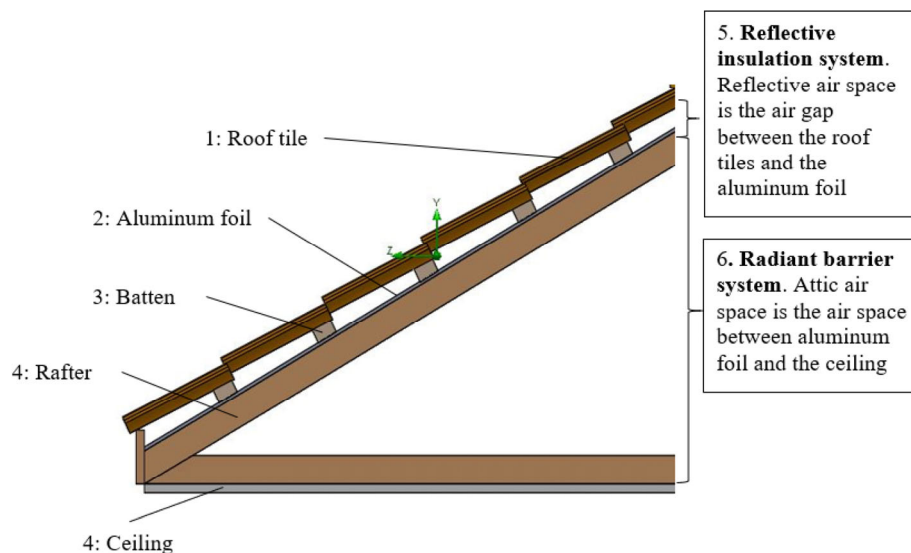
The cross section of the roof assembly incorporating reflective insulation and radiant barrier systems
